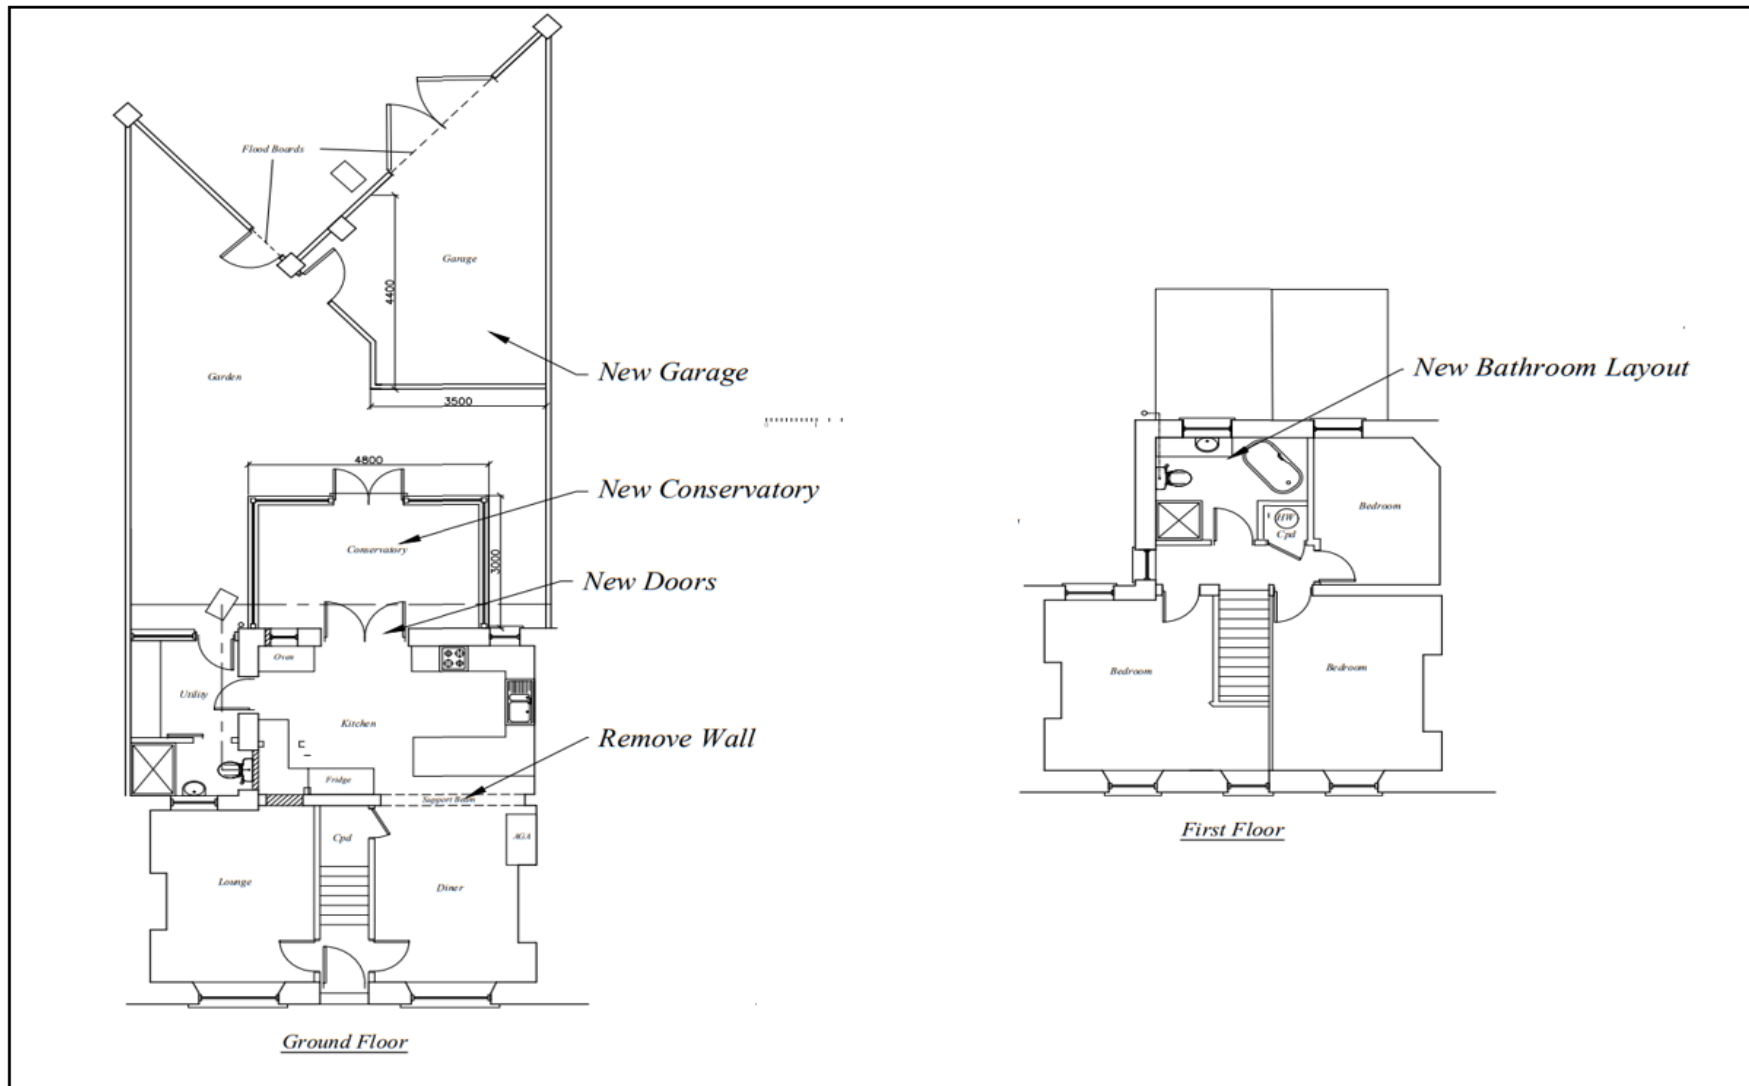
Proposed ground-floor and first-floor plans of St Eia (Paul Osborne).
